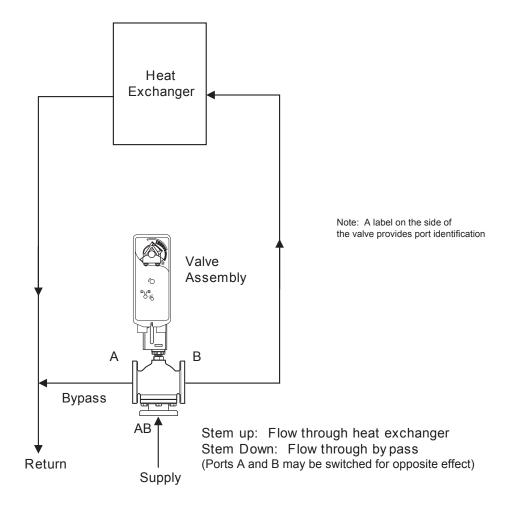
Typical Piping of VB-8303 as 3-Way Diverting Valve
